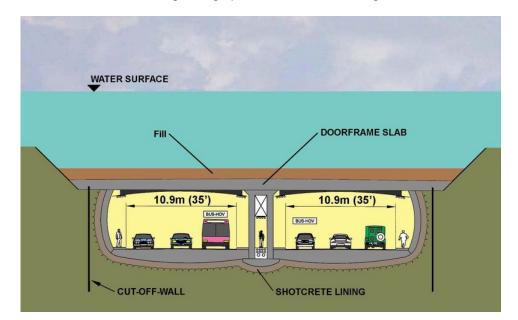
Underwater DFS section proposed for the 3rd Harbor Tunnel at Hampton, Virginia 2001
